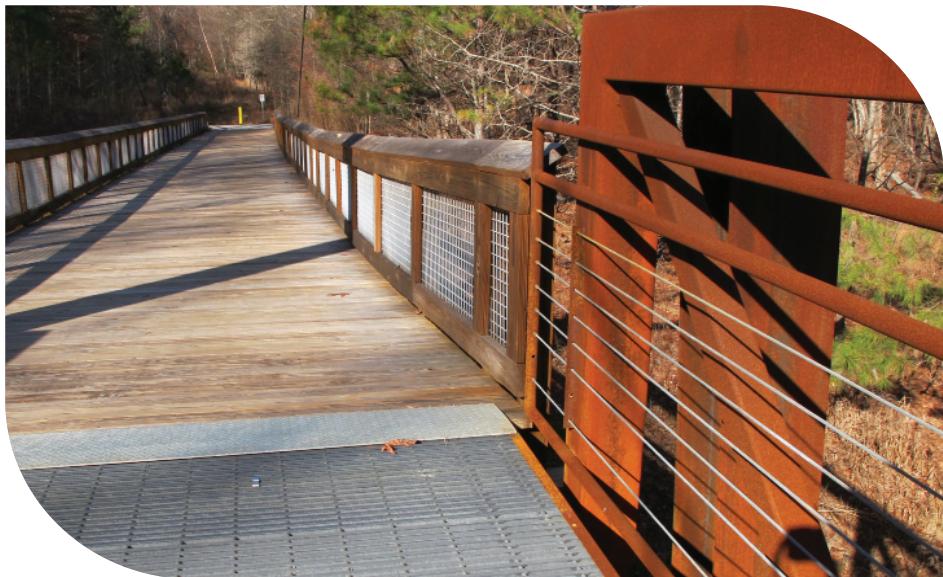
Boardwalk and steel bridge along trail. Ivy Creek Greenway, Gwinnett County, GA.
